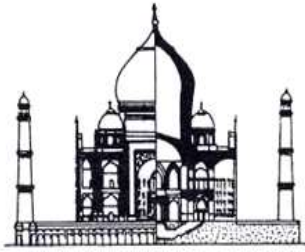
Elevation and section of Taj Mahal tomb(Garg B. B, 1984).
